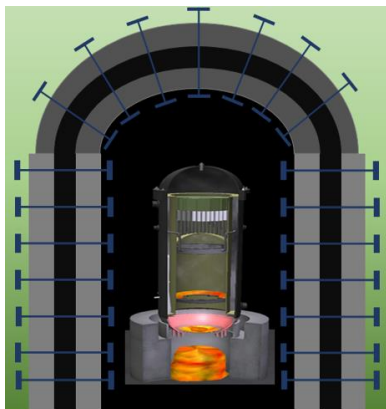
Conceptual drawing of containment building that many fins are installed inside and outside of the building
